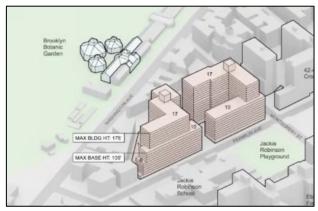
960 Franklin Avenue Revised Proposal- 17 Story Alternative
